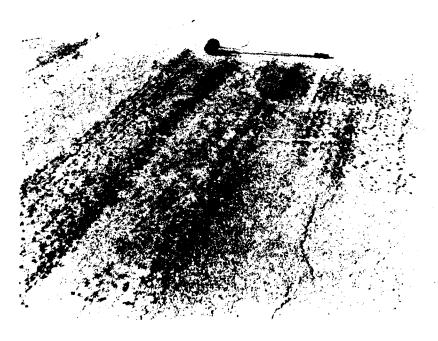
Typical bleeding, Runway 14-32 (R11D)
